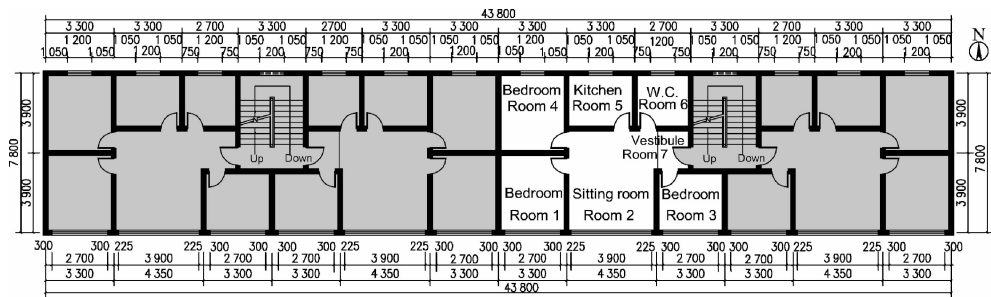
Schematic diagram of standard floor plan (unit: mm)
